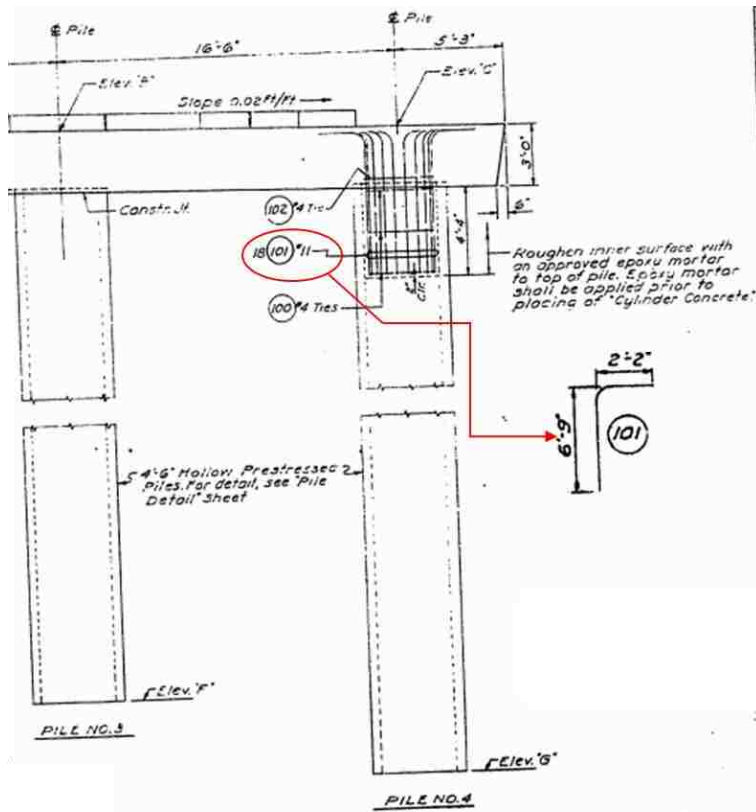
Plug reinforcement details for Le Line Slide Bridge
